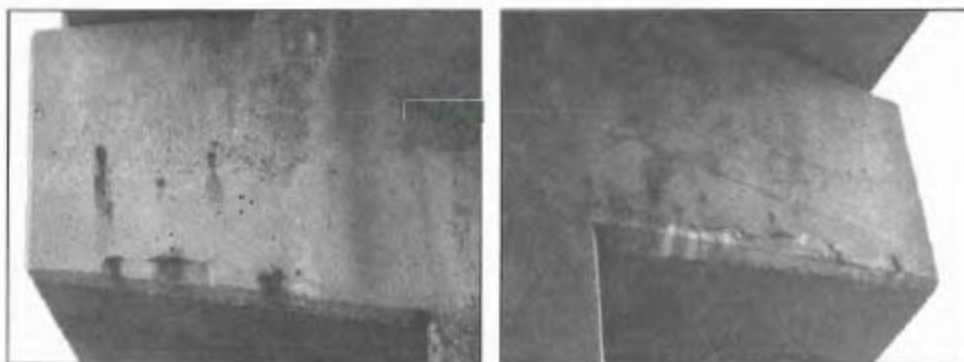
0.04-in. Width Cracks with Rust Staining in the Cantilevers of the Pier 3 Cap
